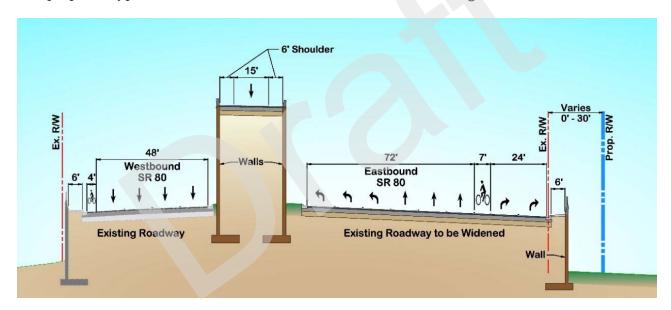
Alternative 1 Proposed Typical Section – SR 80 West of I-95
